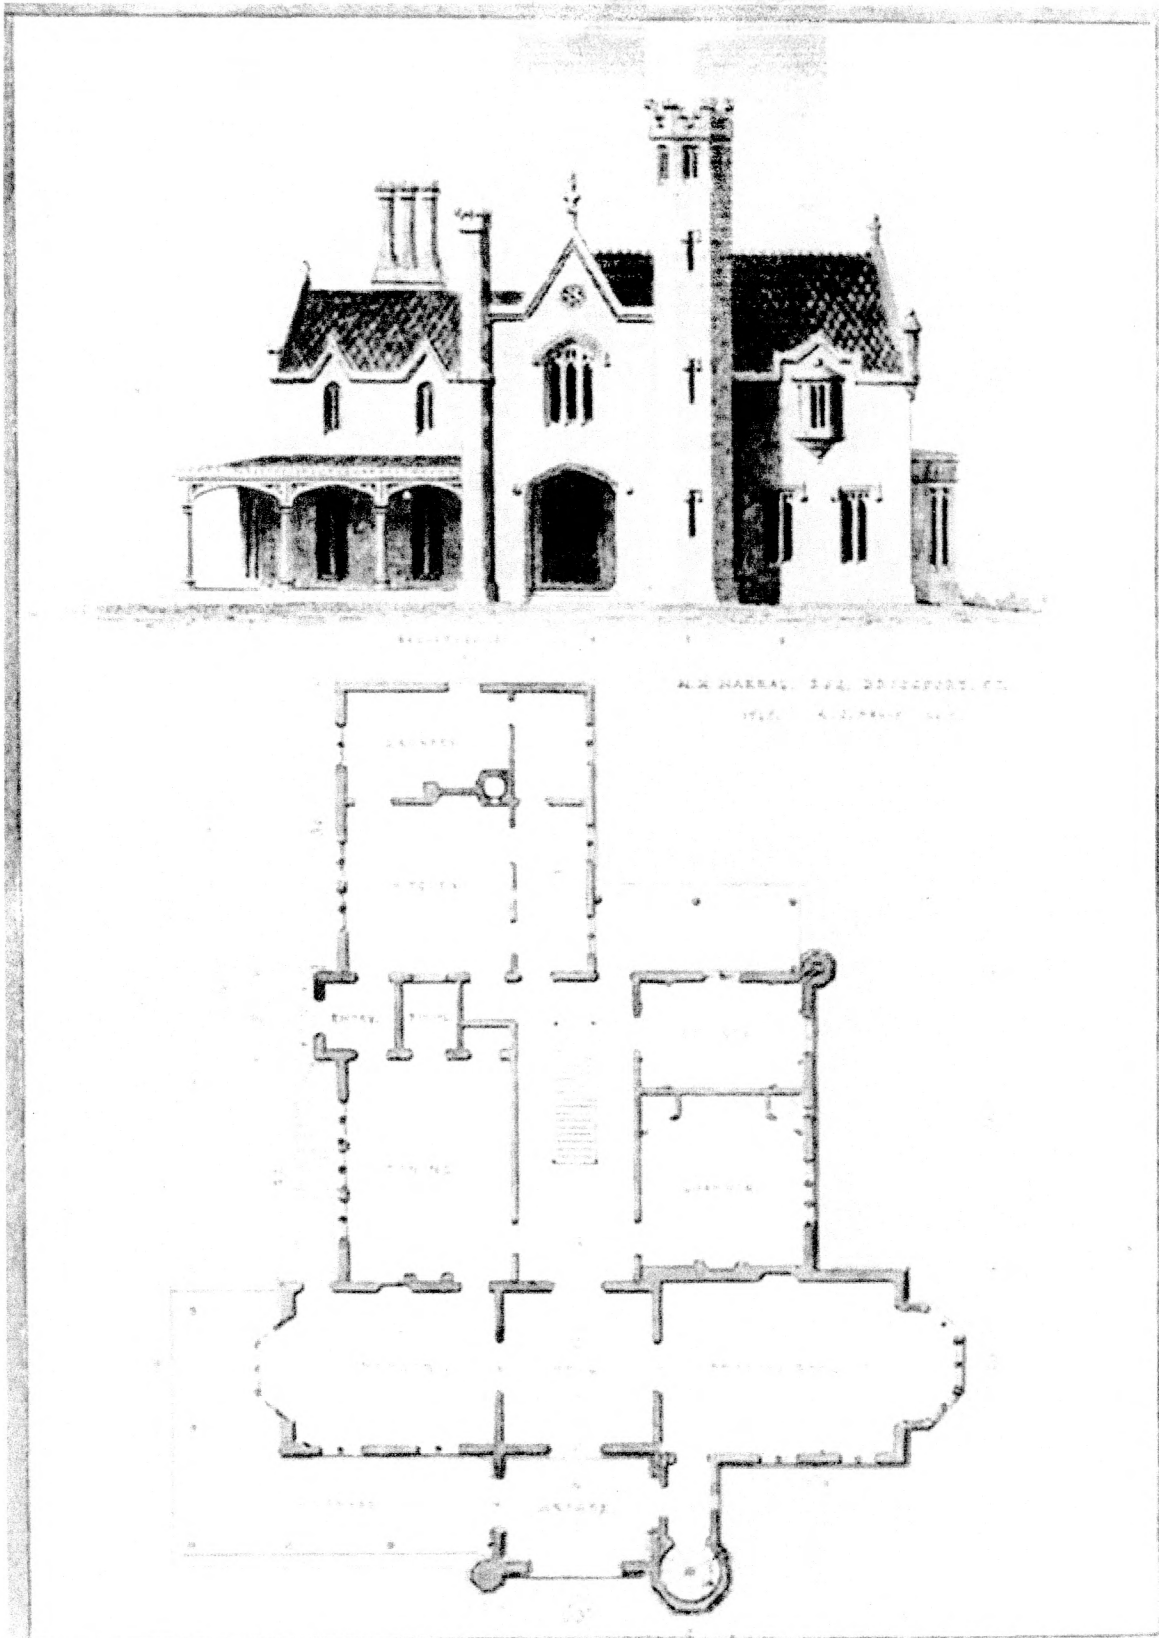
Davis's drawing and first floor plan of the Harral House. Note the similarities between it and the Robert House. Although the stairs are shown going up the middle of the hall, photographs show the stair going up the side wall like in the Robert House.
